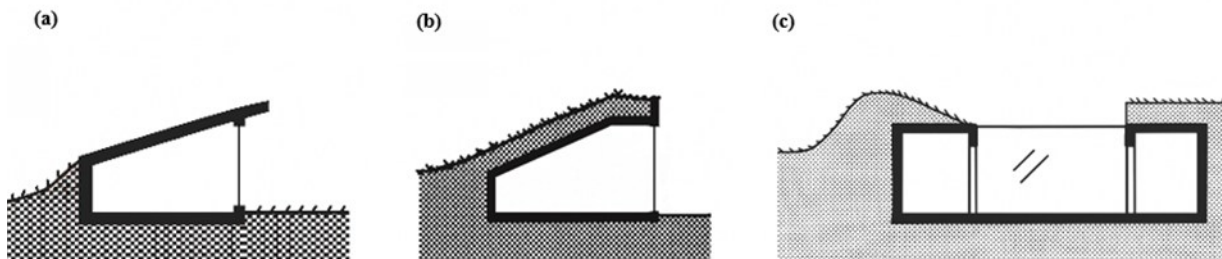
Types of earth-sheltered buildings on the residential scale a) Section of elevational type with conventional roof b) Section of elevational type with soil roof c) Section of atrium type.
